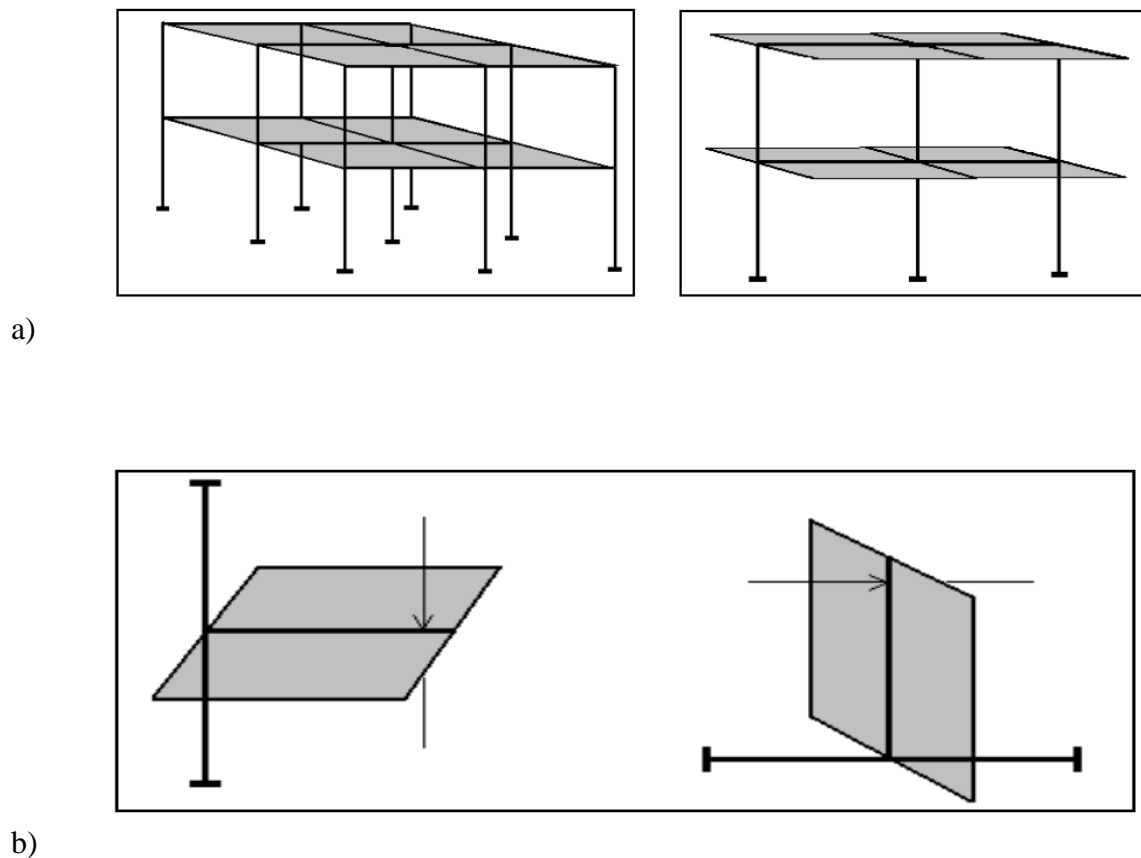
a) Spatial frame and Plane frame sub-assembly of the structure b) Testing setup outline for Horizontal T and inverted T specimens (Castiglioni and Drei, 2016).
